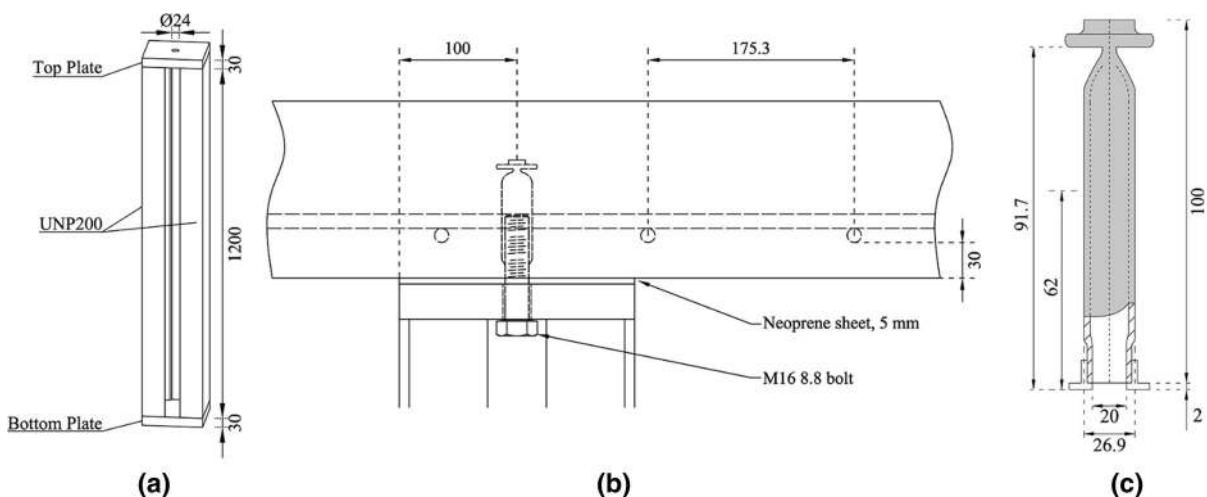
Details of the support: a dimensions of the steel support; b details of the anchorage and reinforcement spacing; c drawing of the anchorage device
